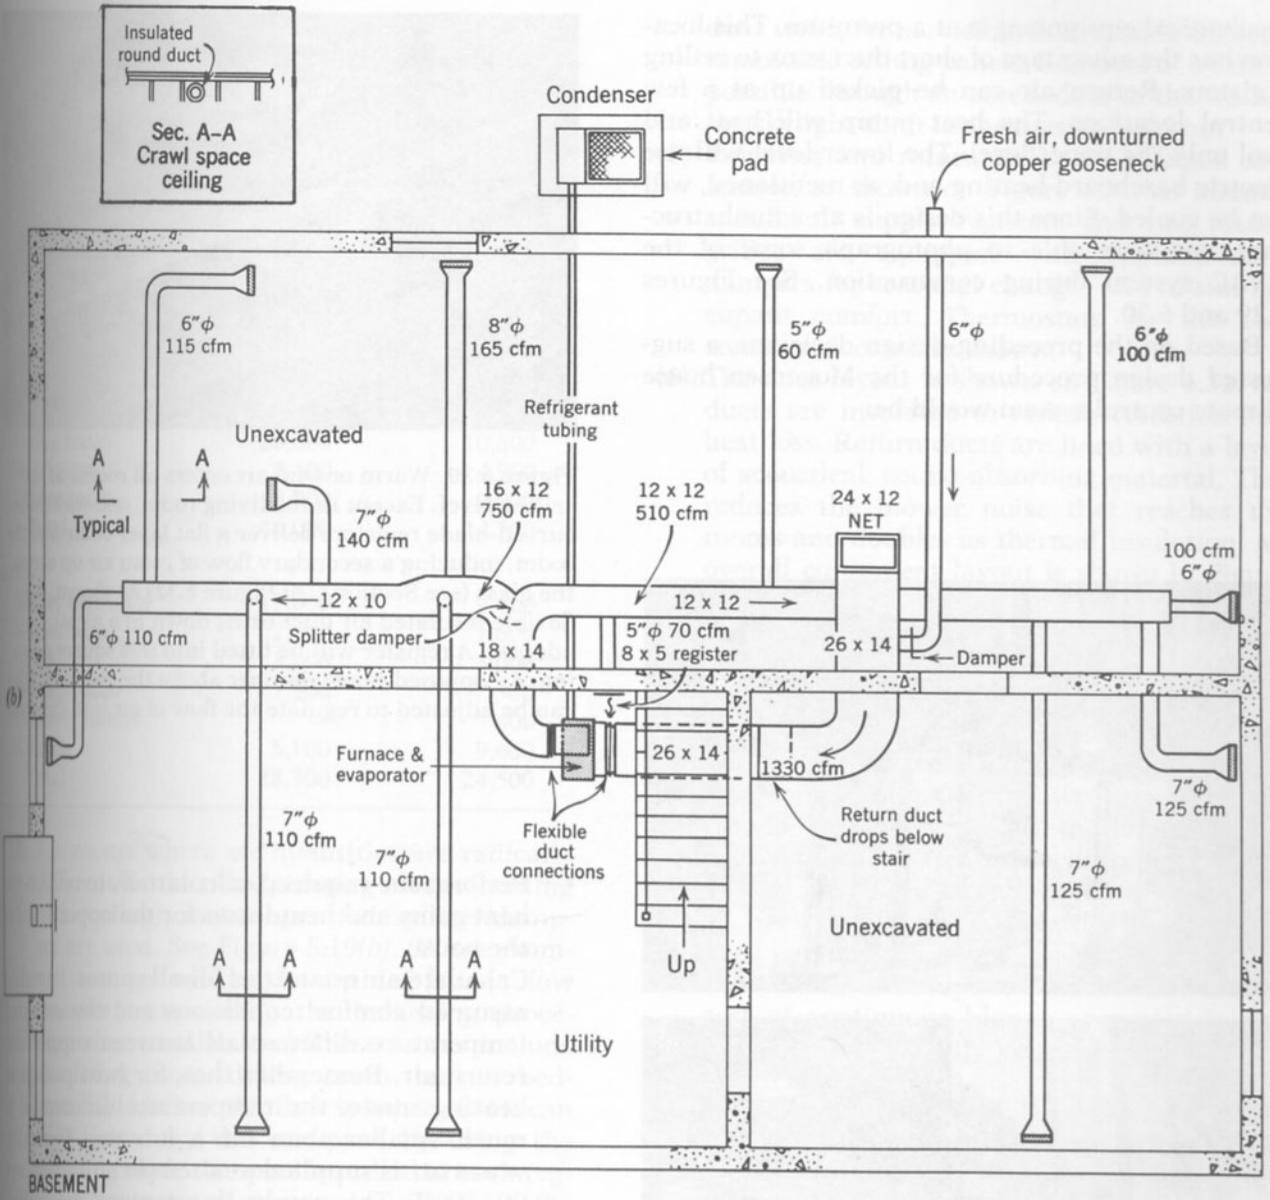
Duct layout in basement and unexcavated space of The Basic House.
